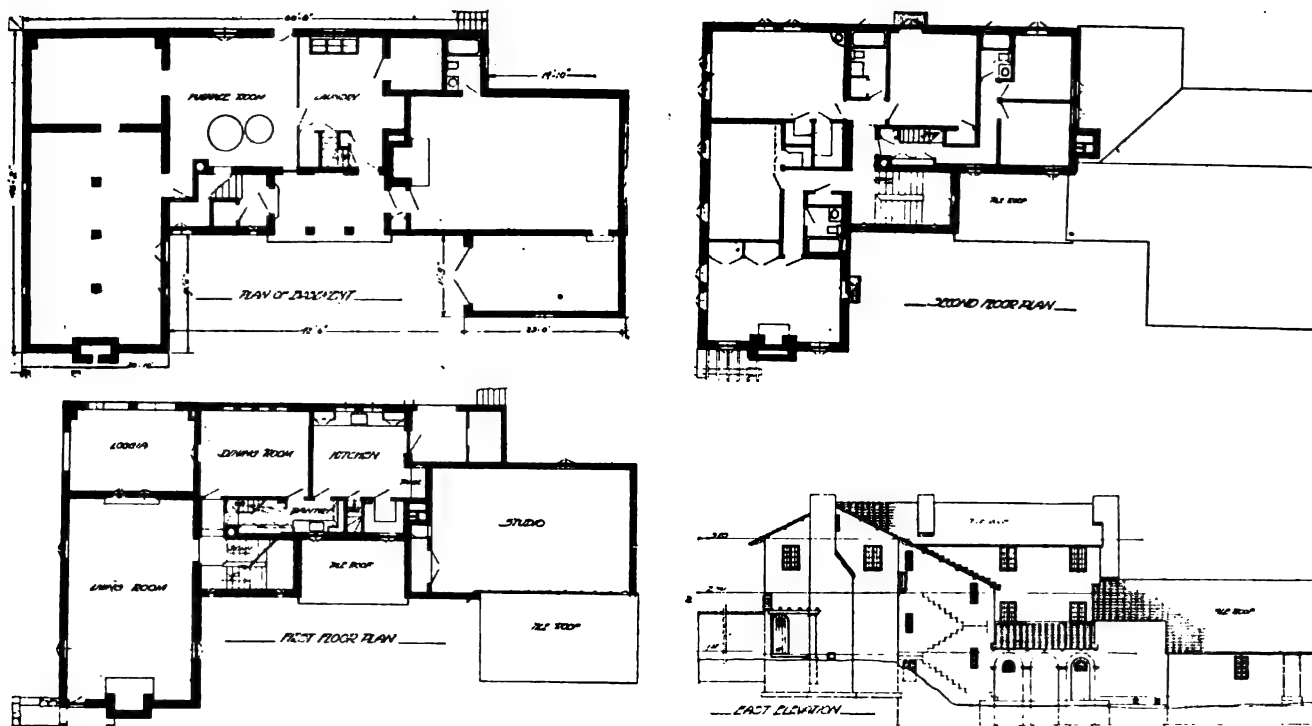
FLOOR PLANS AND EAST ELEVATION, MR. HOLLAND'S HOUSE, WHICH WAS ORIGINALLY DESIGNED FOR HOLLOW TILE AND SUBSEQUENTLY CHANGED FOR CONCRETE
